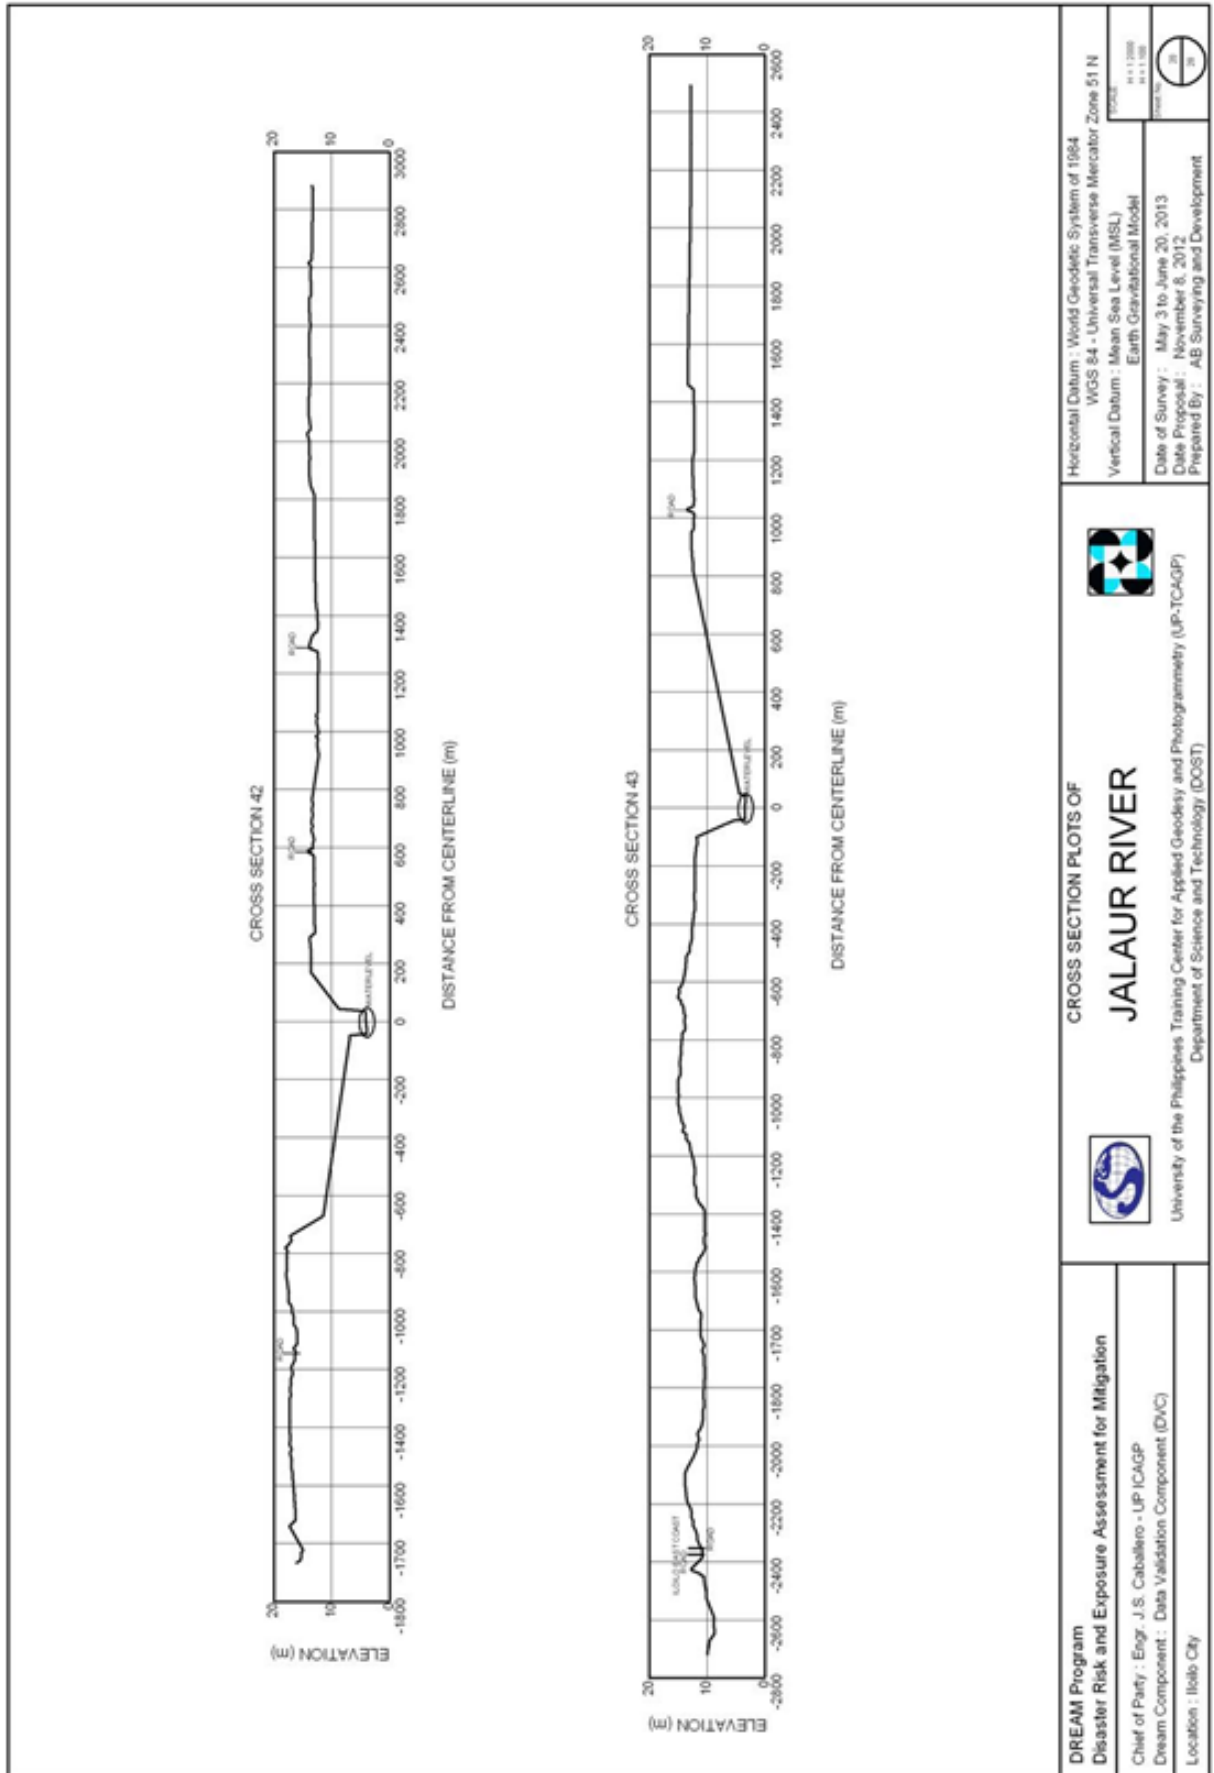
Sheet No.20 of the Cross-section plan of Jalaur River
